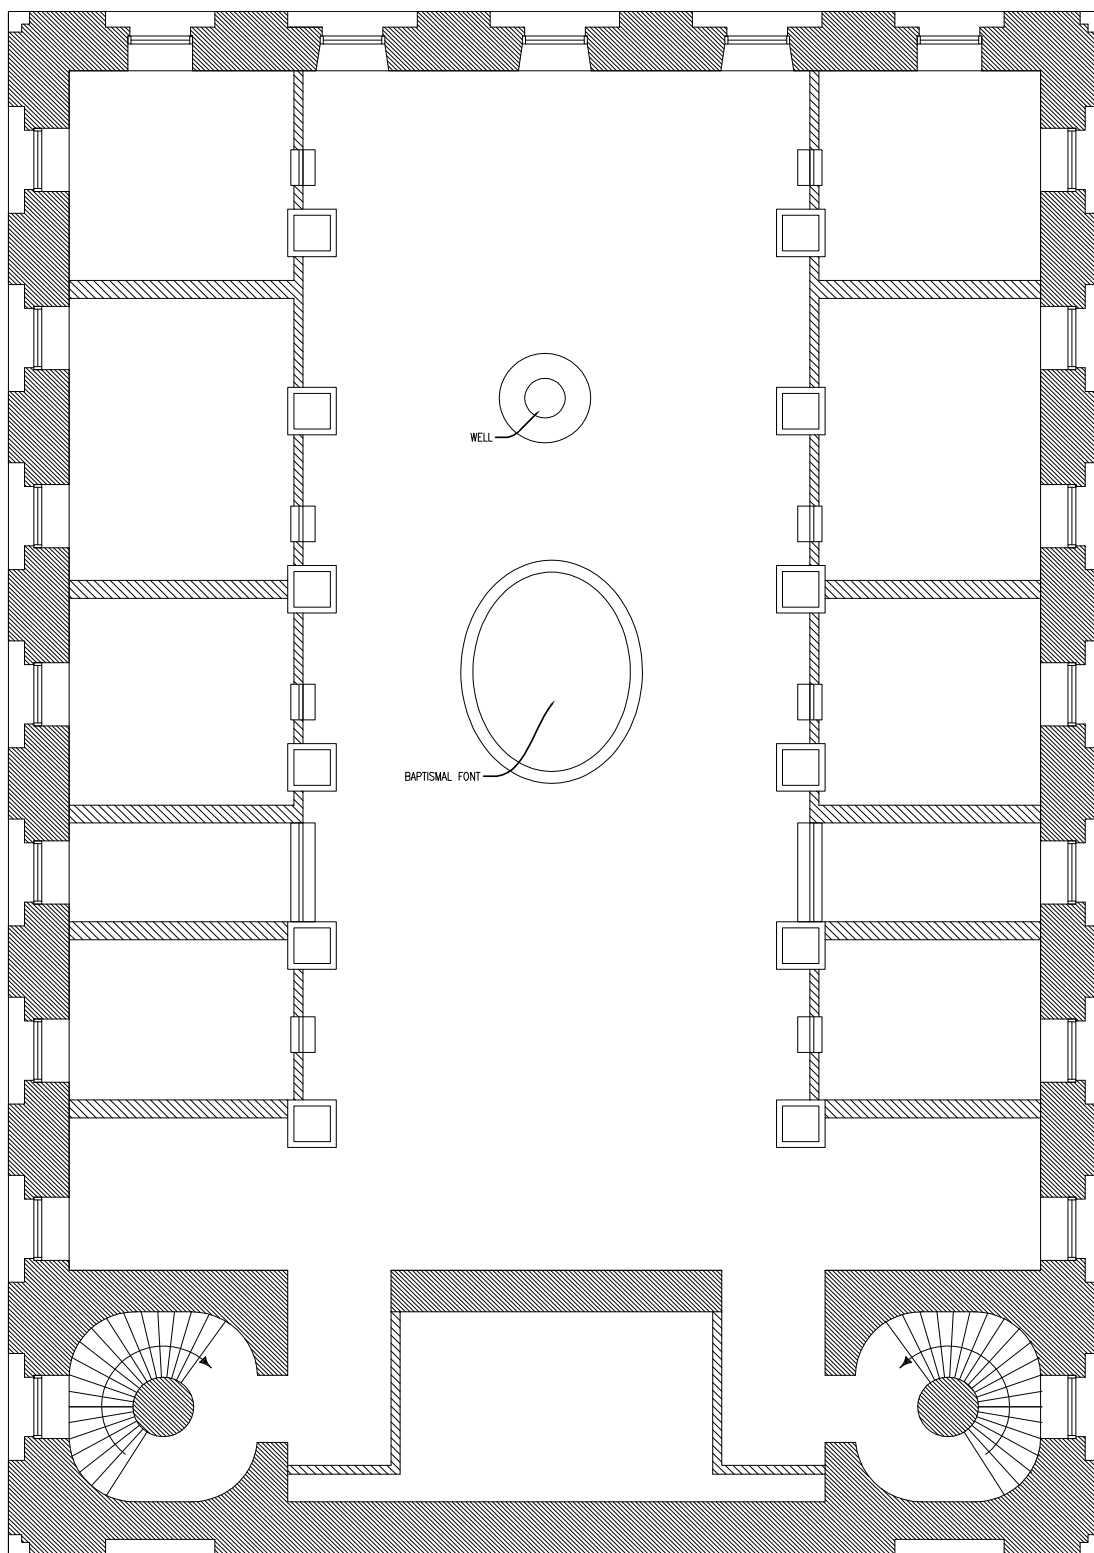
Basement floor plan based on Lisle Brown and FFKR Architects reconstruction drawings. Drawn by author.
